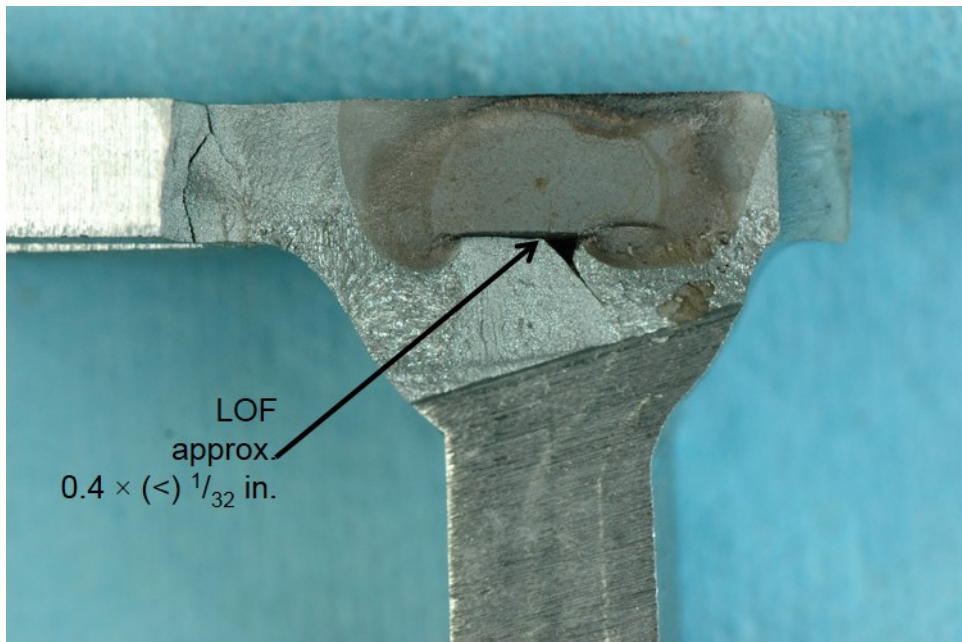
Fracture surface photographed perpendicular to the camera to clarify the LOF — crack to the south of rib in MU3 at 35 degrees from the rib soffit
